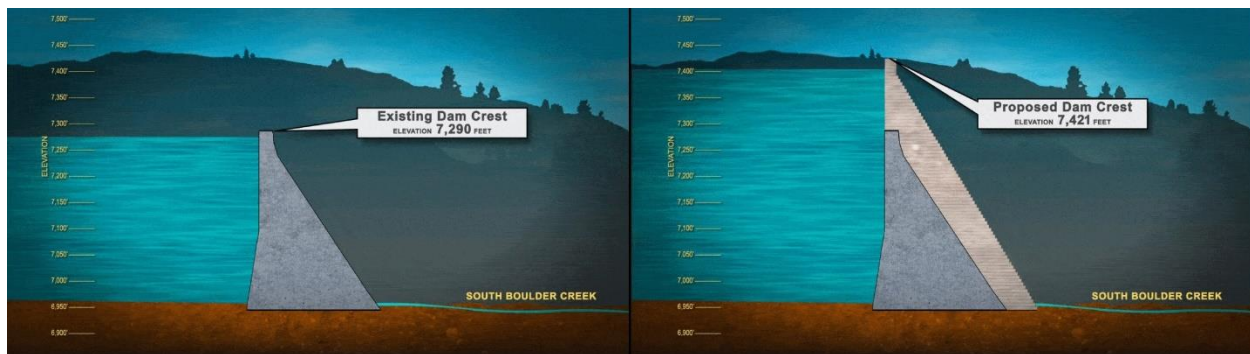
A comparison of the existing Gross Dam and proposed Gross Dam. On left, the existing structure with crest elevation of 2221.9 m, and on right, the proposed structure with crest elevation of 2261.9 m. [<https://grossreservoir.org/construction/raising-a-dam/>]
